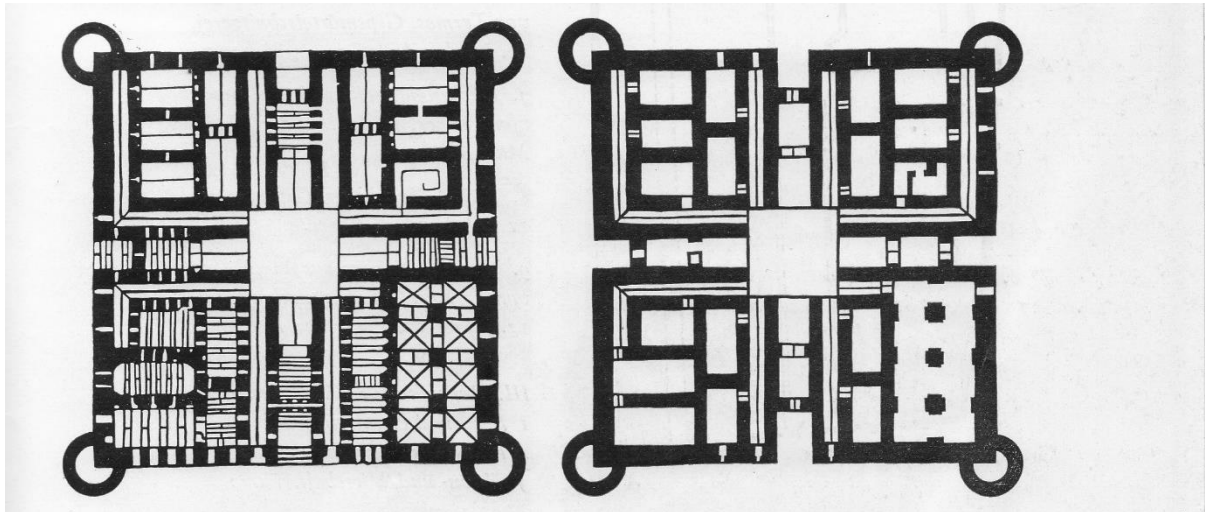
Kyrk Kyz, Uzbekistan, ground floor and first floor plans, from Pugachenkova 1981:17.
